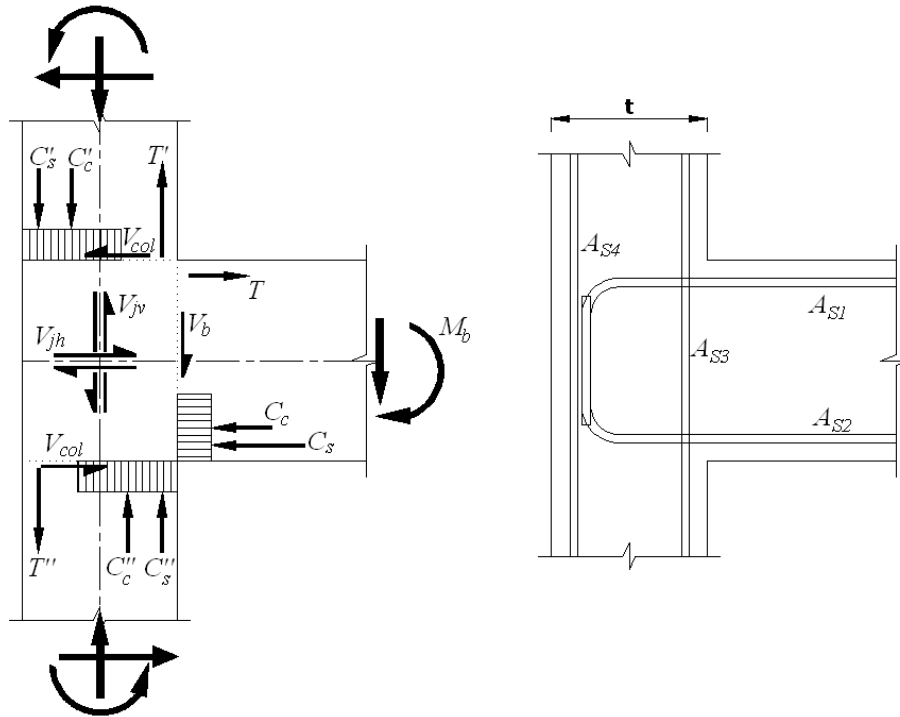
Free body diagram of an exterior beam-column joint in a multi-storey frame
